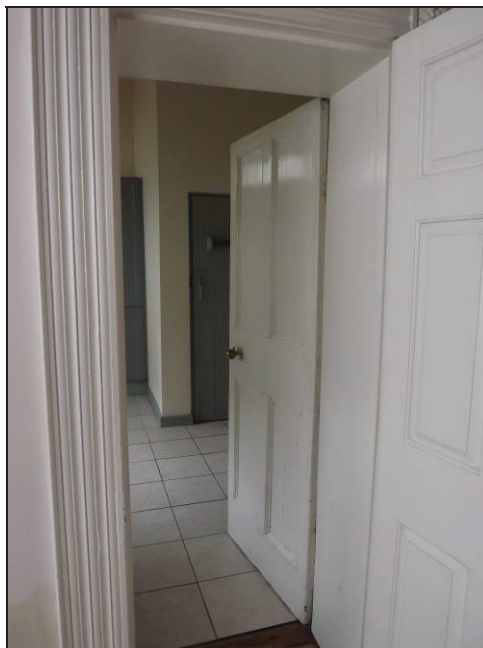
View looking north showing the wide separation between the door in Room 11 (foreground) and the door in Room 12
